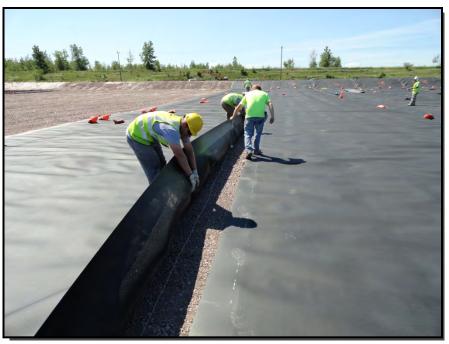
The Phase I geomembrane was unfolded over the completed LP soil layer prior to welding a connection to the Phase II geomembrane.
